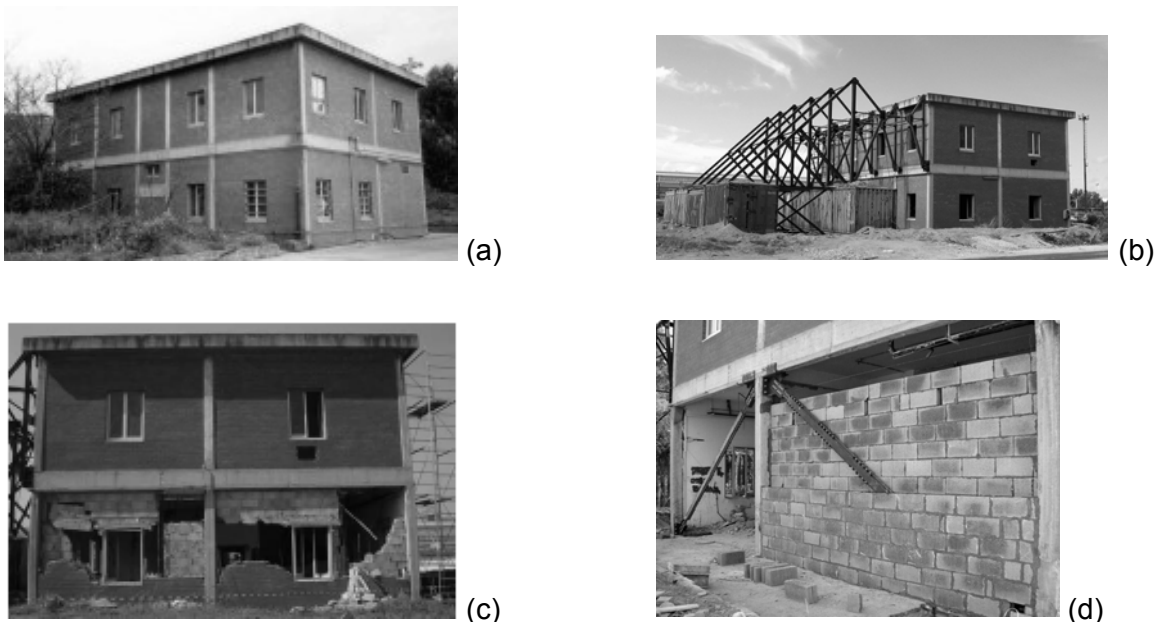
Bagnoli RC building: (a) original configuration; (b) reacting structure; (c) damage after first test; (d) consolidation by BRBs
